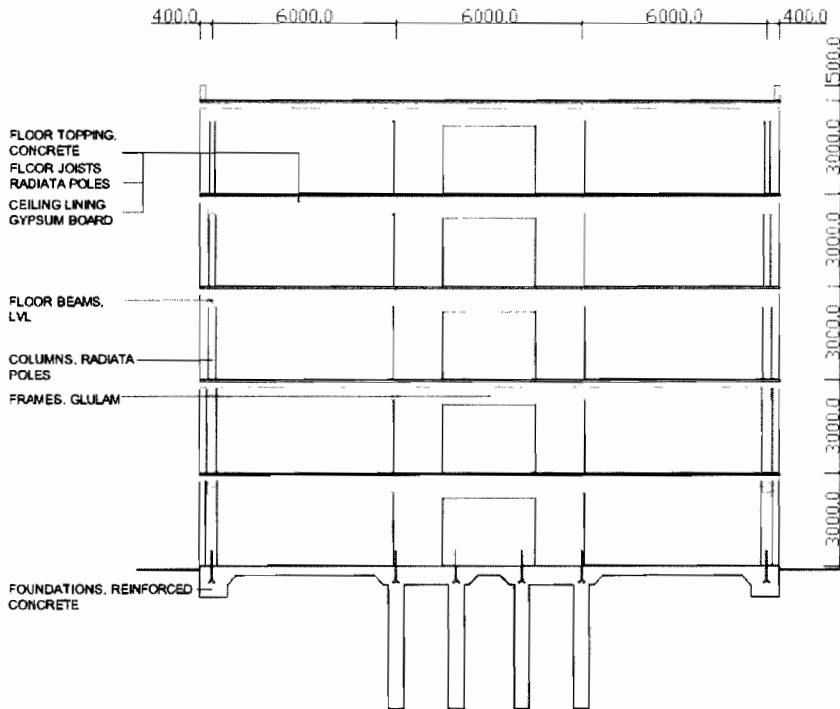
, Prototype timber commercial building, cross-sections, A-A & C-C
